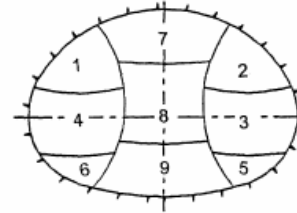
Twin side drift and central pillar excavation method. Temporary support consists of double wire mesh reinforced 250 - 300 mm thick shotcrete shells with embedded lattice girders or HEB 160 steel sets at 0.75 - 1 m spacing.
